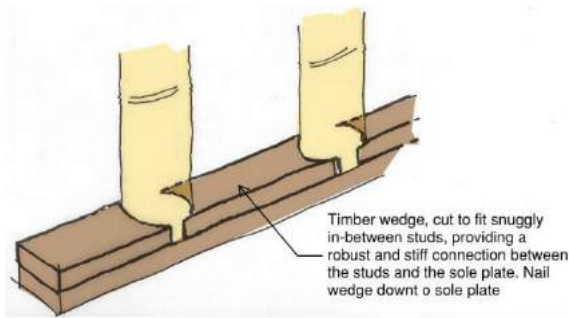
Detail of long timber “wedges” placed in-between timber studs, to provide an in-plane load path for the shear loads inside the engineered bahareque shear wall
